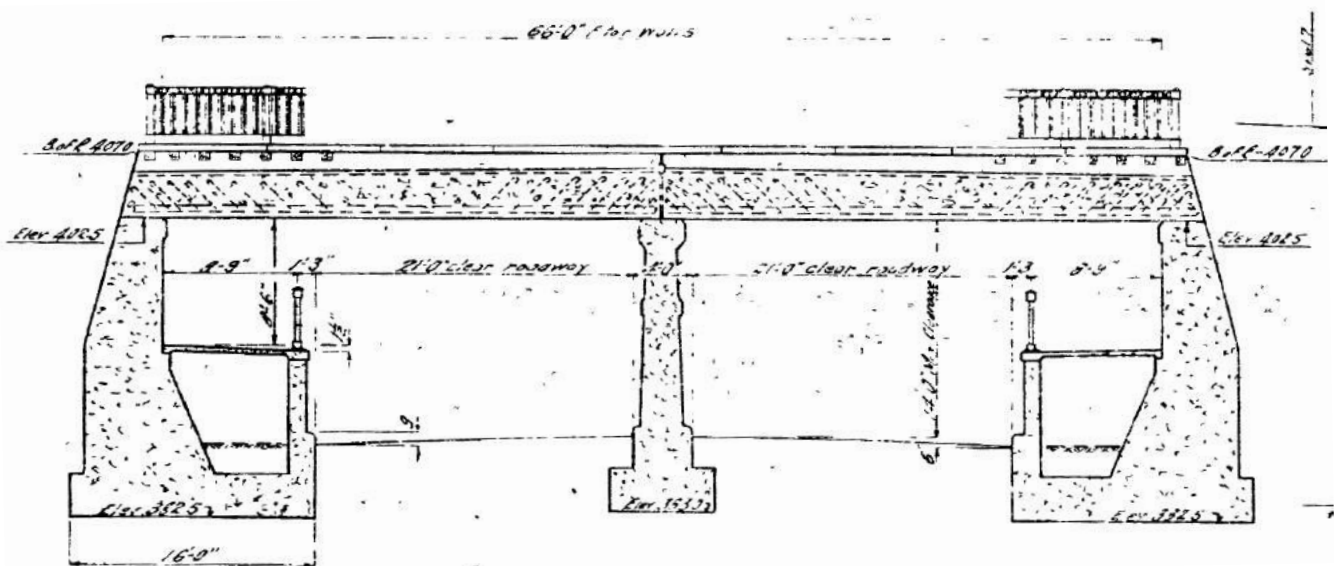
Typical Cross-Section for the Rail Underpass at St. Clair Avenue West
